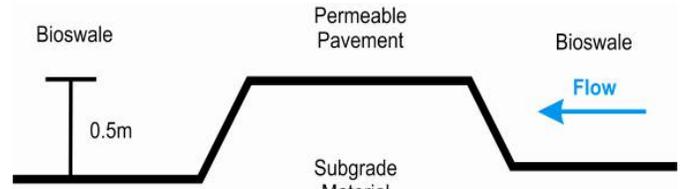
Grading of the bioretention unit and permeable pavement driveway subgrade.
